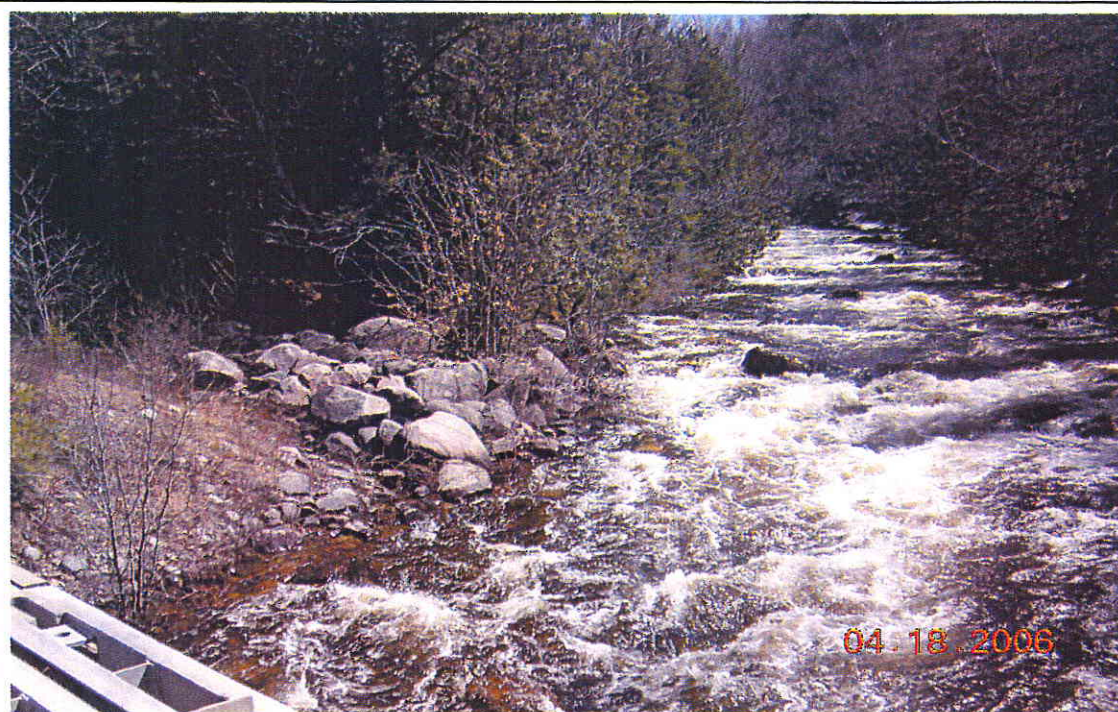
Rapid River upstream, to the east, of the existing bridge.
